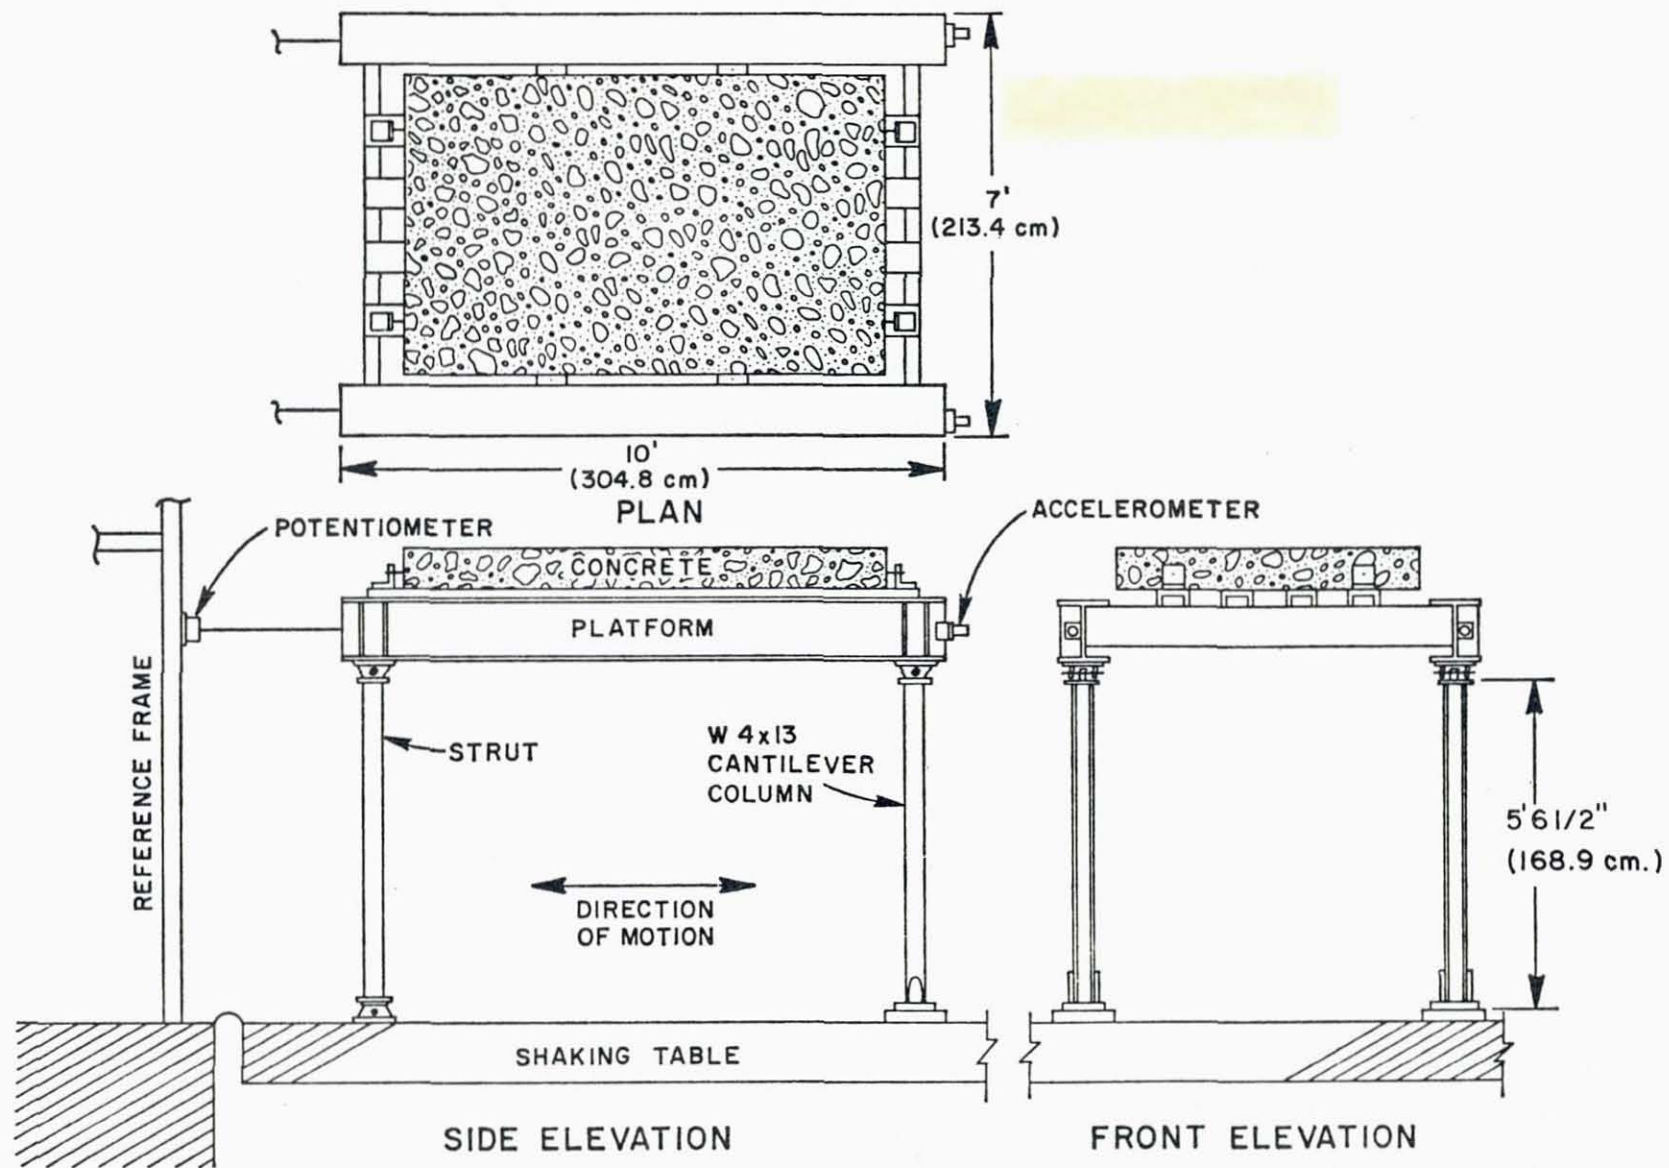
PLAN AND ELEVATION VIEWS OF TEST STRUCTURE
